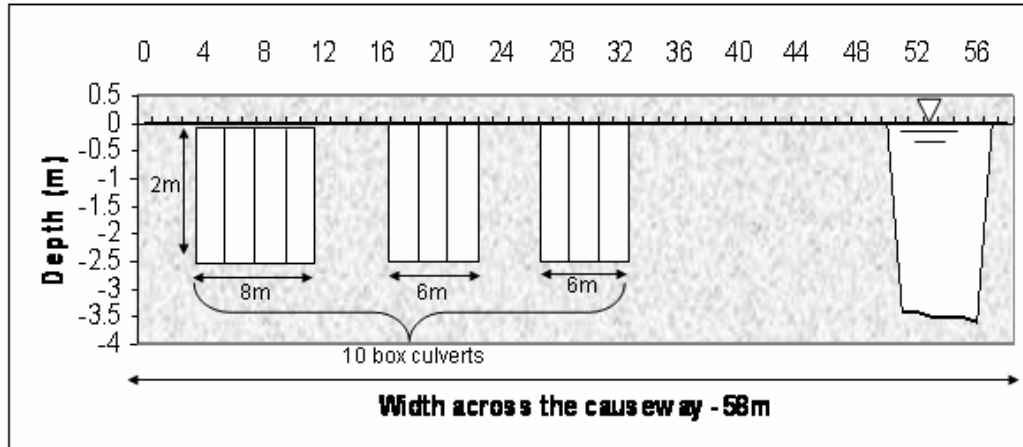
Schematic representation of proposed modifications to the causeway with 10 box culverts each of 2mx2m replacing existing 8 cylindrical culverts. Box culverts are placed 0.5m below of the causeway top surface.
